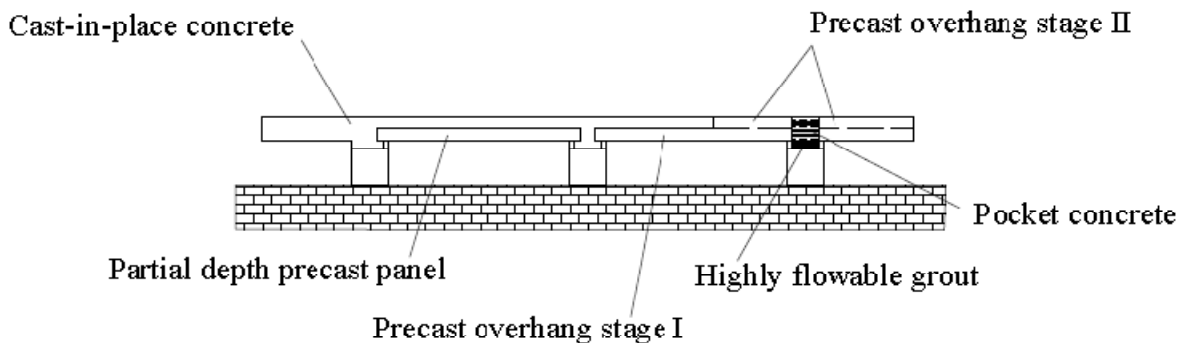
Reinforcement detail for precast bridge deck overhang.
